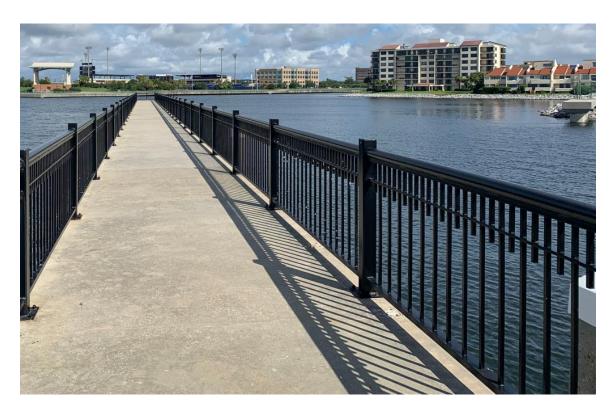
Concrete Breakwater at south end of area (Looking West)
